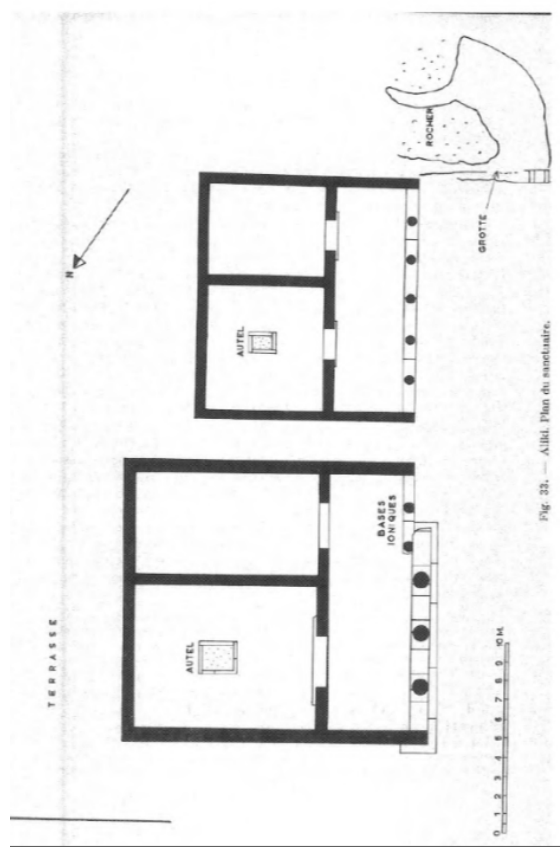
Ground plans of the buildings at Aliko (Daux, 1968: fig.33)
